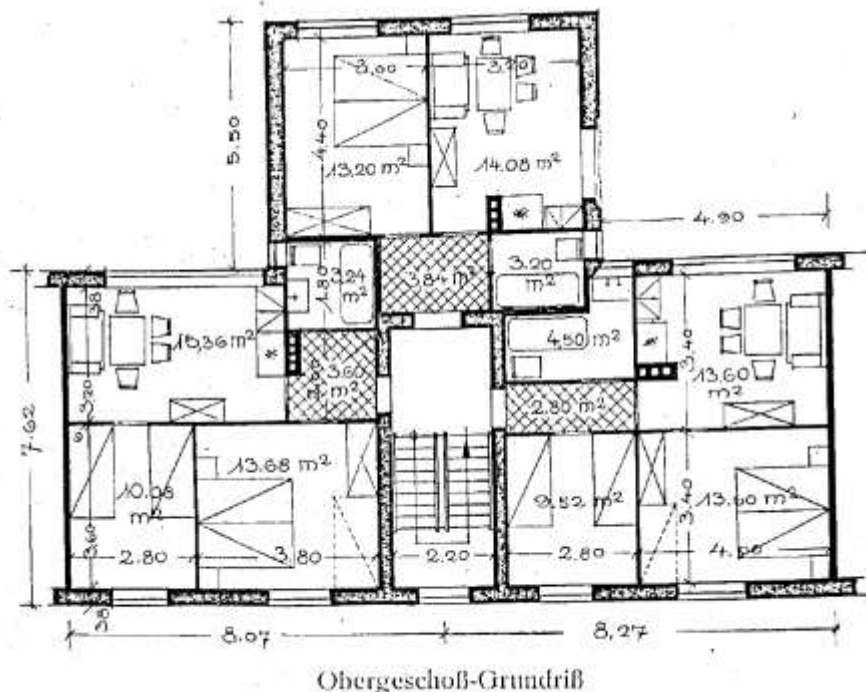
Sample building plan developed by RFG with three apartments accessible from the staircase.
